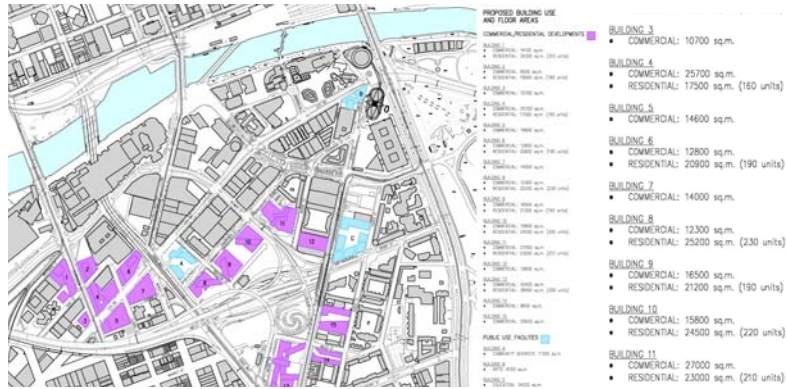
Plan view from digital model showing proposed new buildings and area and residential units and commercial yields.
